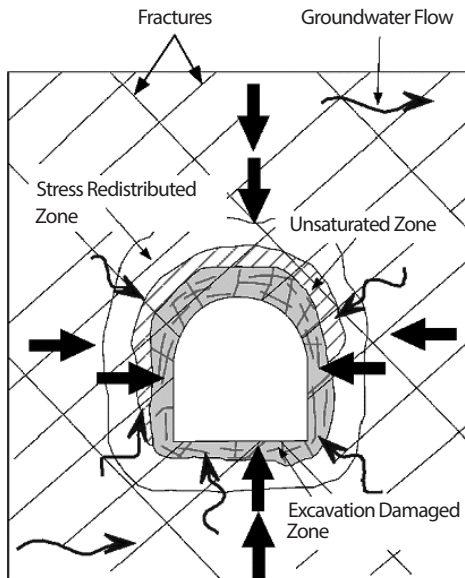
Generation of the excavation damaged zone (EDZ) around the underground tunnel [16].
